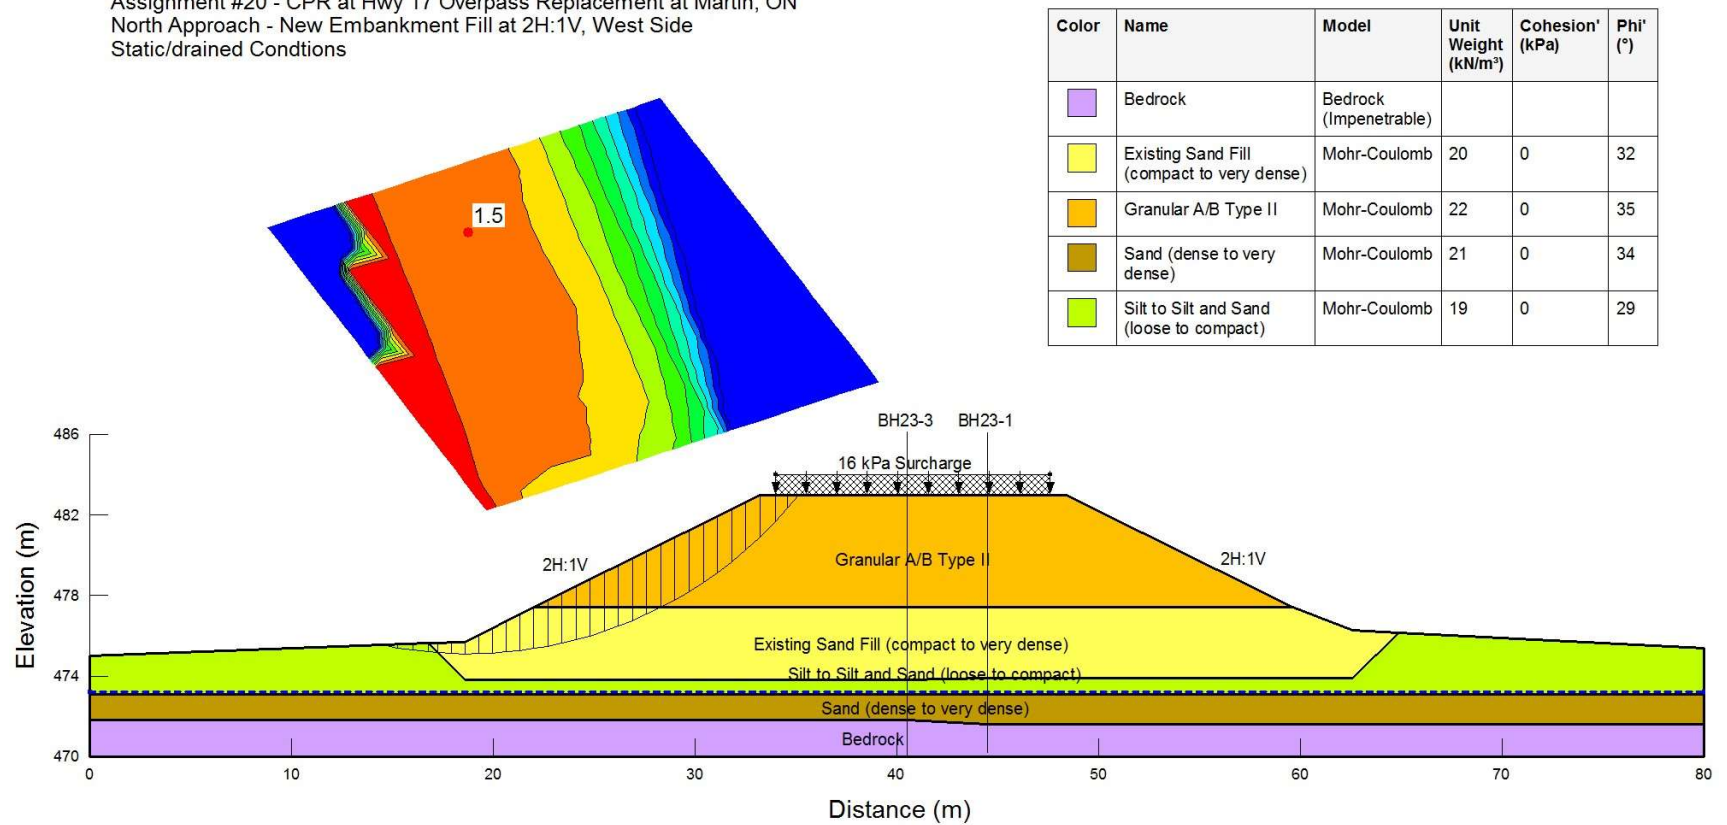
Slope stability Analysis for Approach Embankment Side Slope (West Side) – Drained Static Conditions
